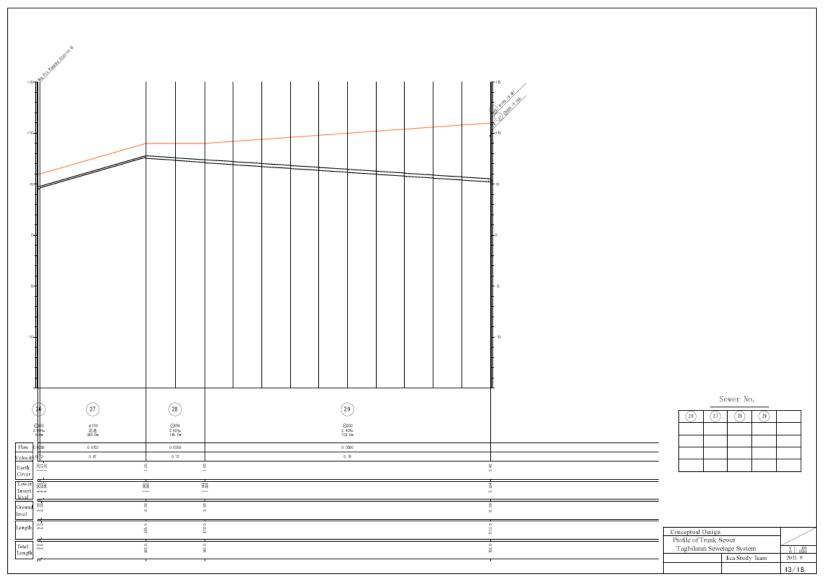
Profile of Trunk Sewer (Tagbilaran Sewerage System)
